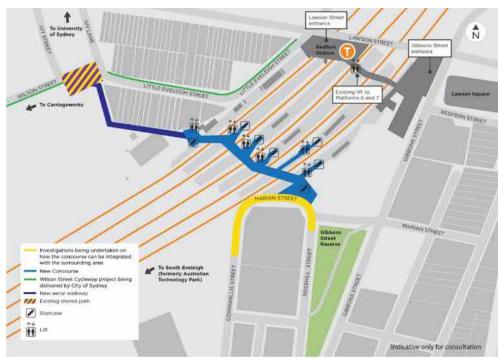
Option 3 – Marian Street to Platform 1 concourse with aerial walkway to Wilson Street
